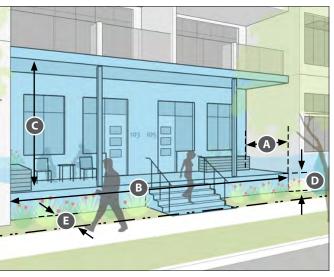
A Dooryards / Terraces Figure 3.8.3.B Arcades
